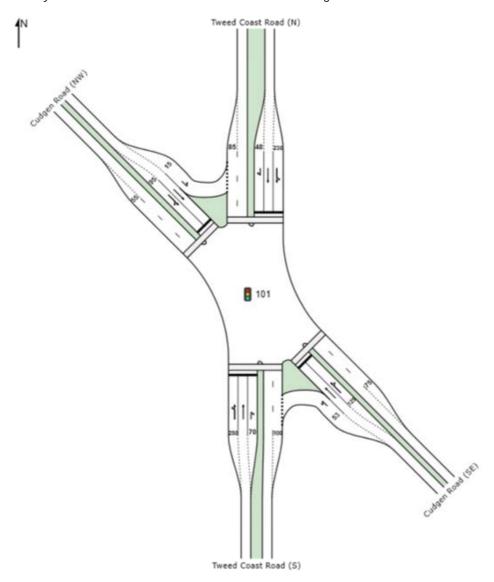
Tweed Coast Road / Cudgen Road SIDRA Intersection Layout - Existing
